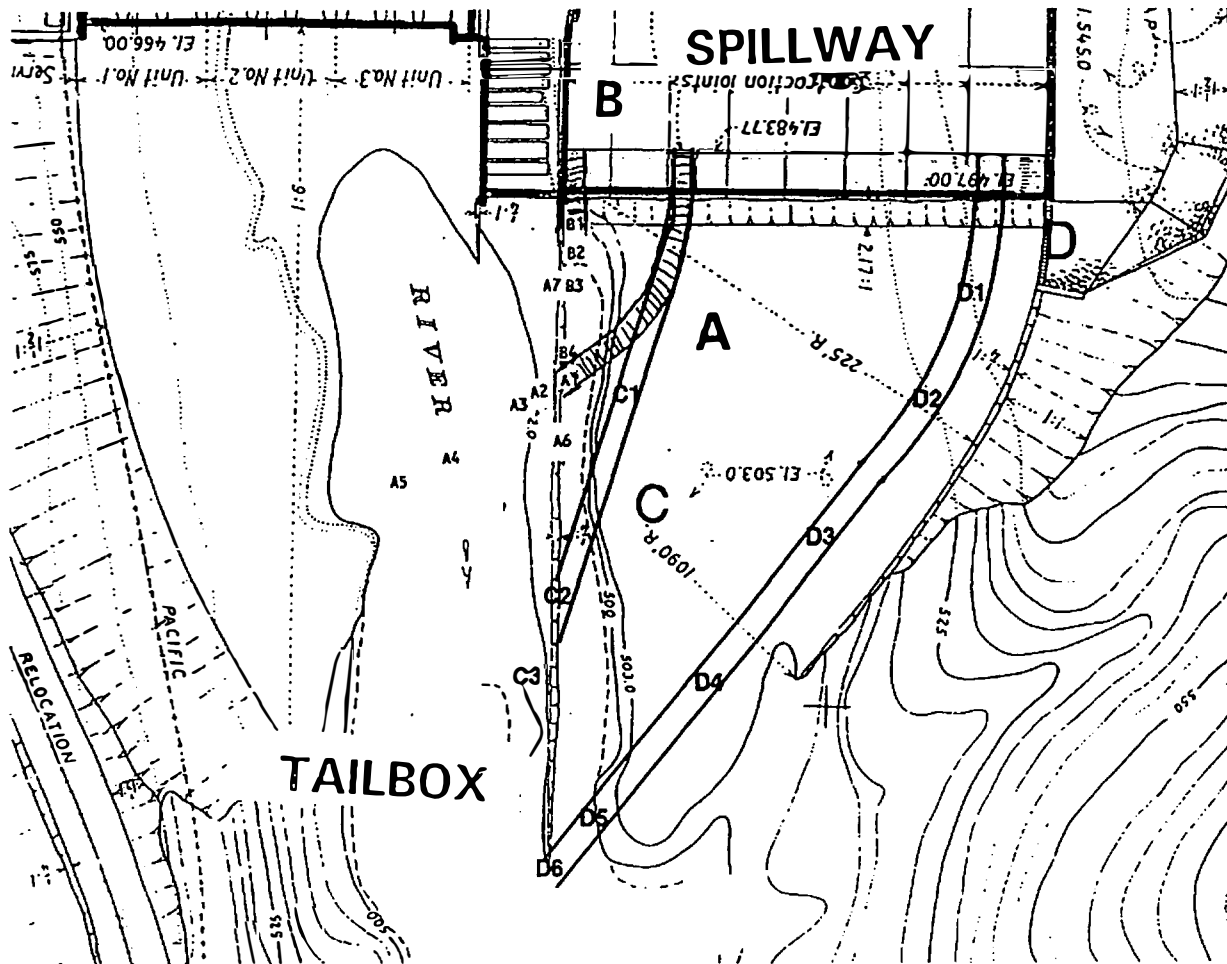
Plan view of the stilling basin and downstream rock bench showing the channel locations that were tested.
